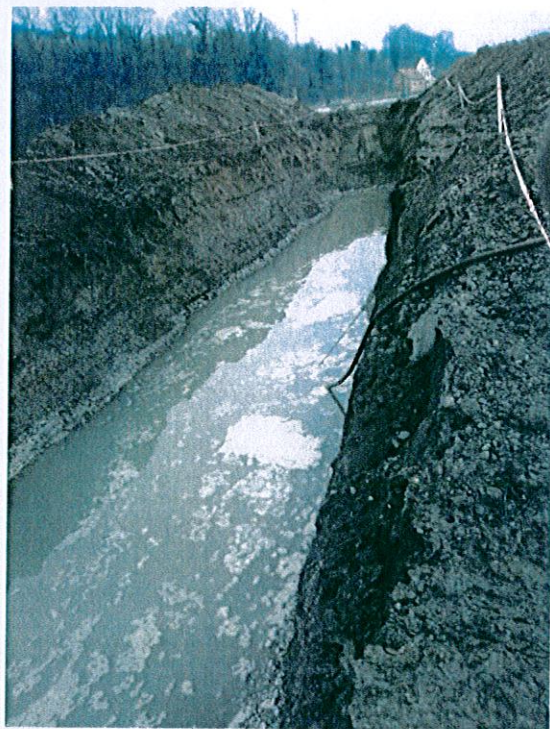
Groundwater inflow (app. 4 l/s) affected stability of trench wall.
